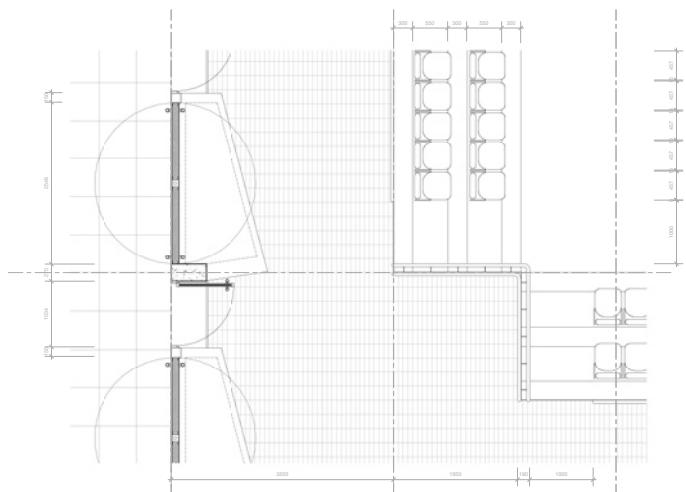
Detail floor plan of rotating acoustic facade panels
